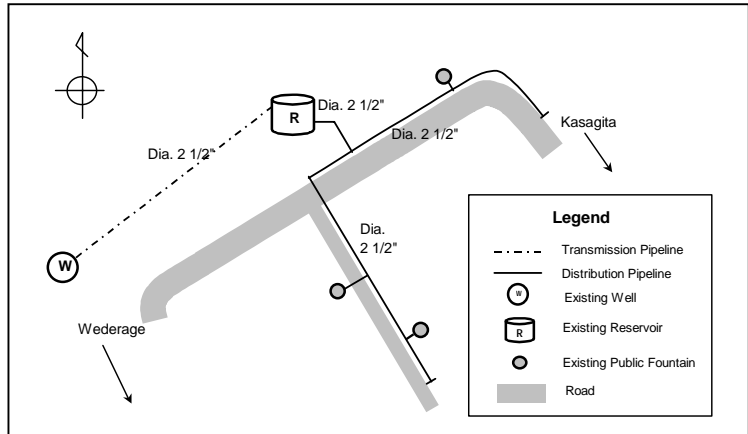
Layout of Existing Facilities of Nemelefen
